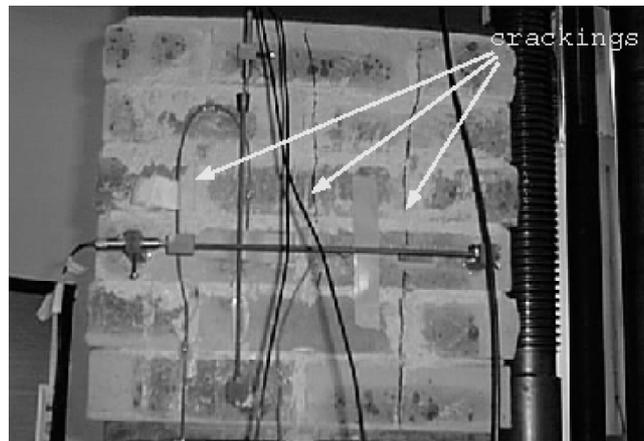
Cracking pattern of the masonry prism for the uniaxial compression test
